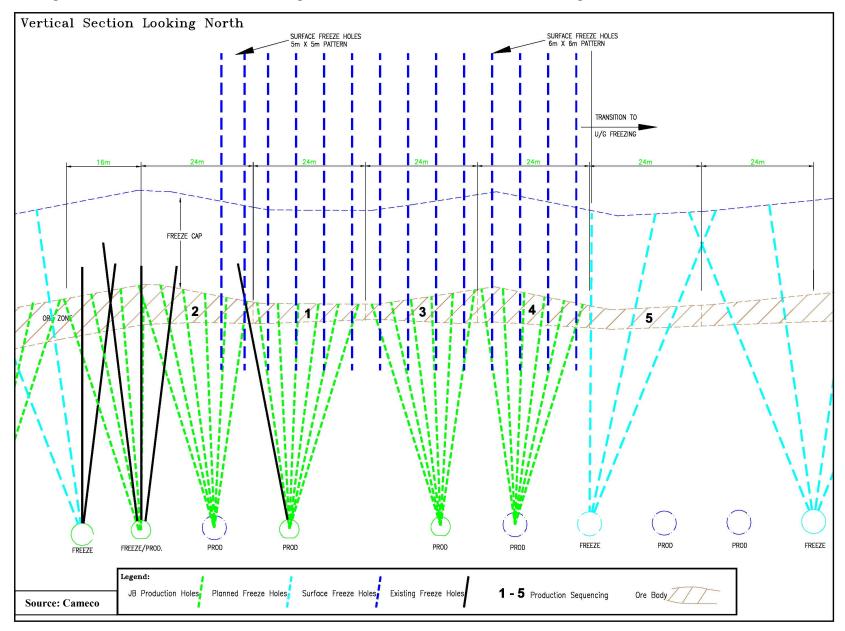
JBS and Freezehole Arrangement – Schematic Vertical Section Looking North
